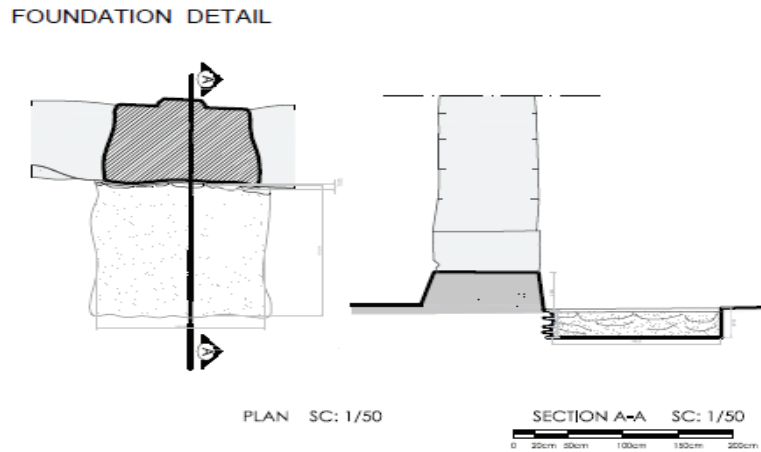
Foundation detail, partial plan and transverse section from a gallery
